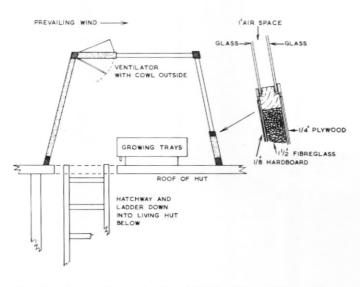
End-section view showing the constructional details of the outside greenhouse at Halley Bay.
